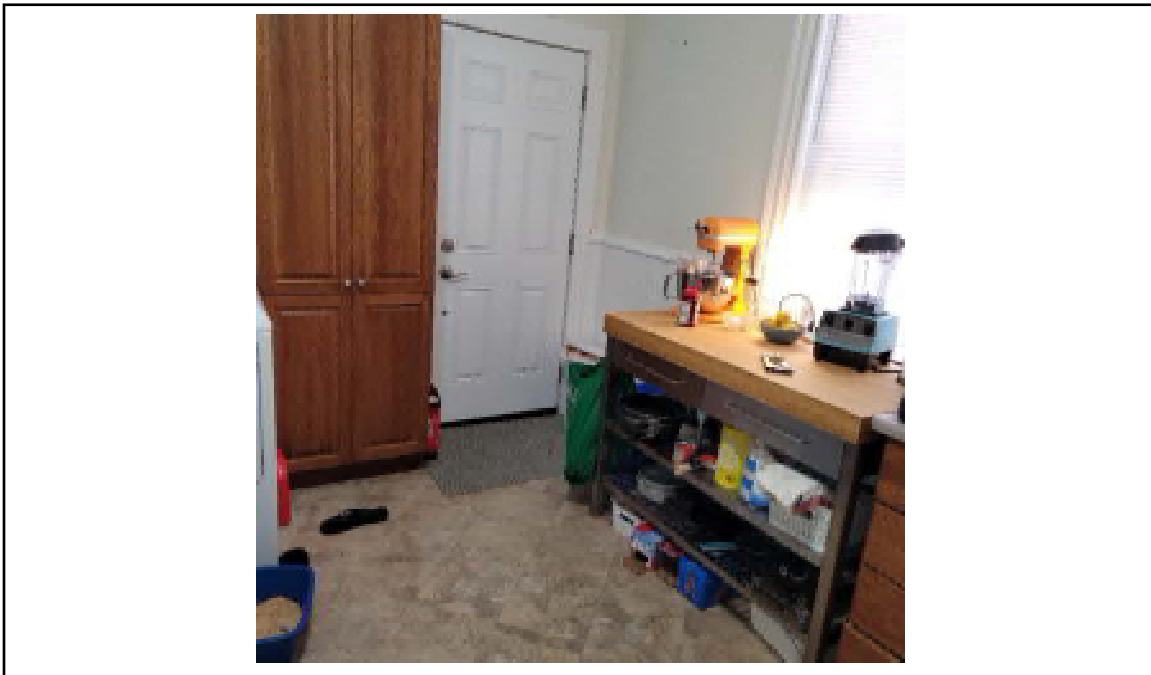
Interior floor and wall finishes of 16 Hawthorne.
